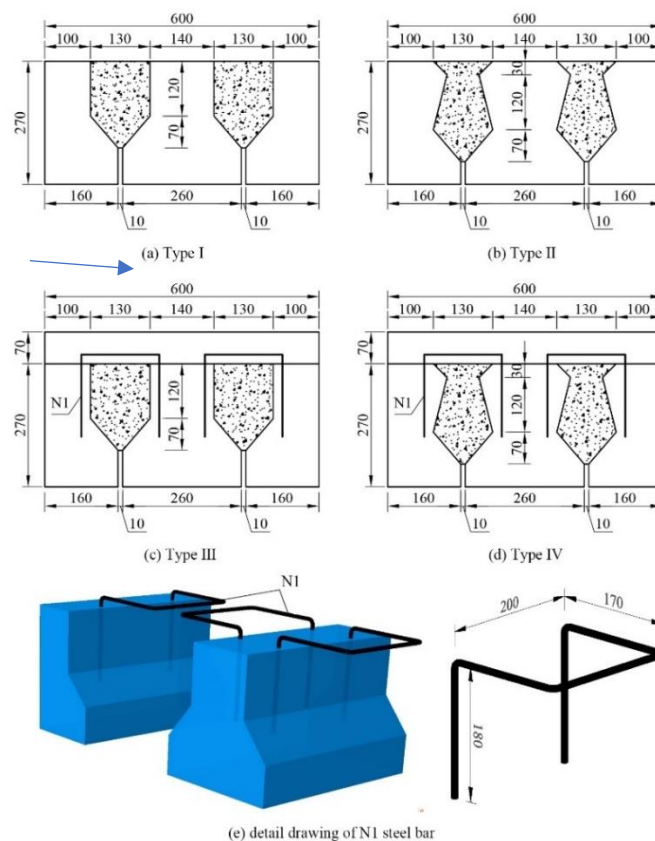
Configuration of specimens (note: all dimensions in mm): (a) Type I; (b) Type II; (c) Type III; (d) Type IV; (e) detail drawing of N1 steel bar.
